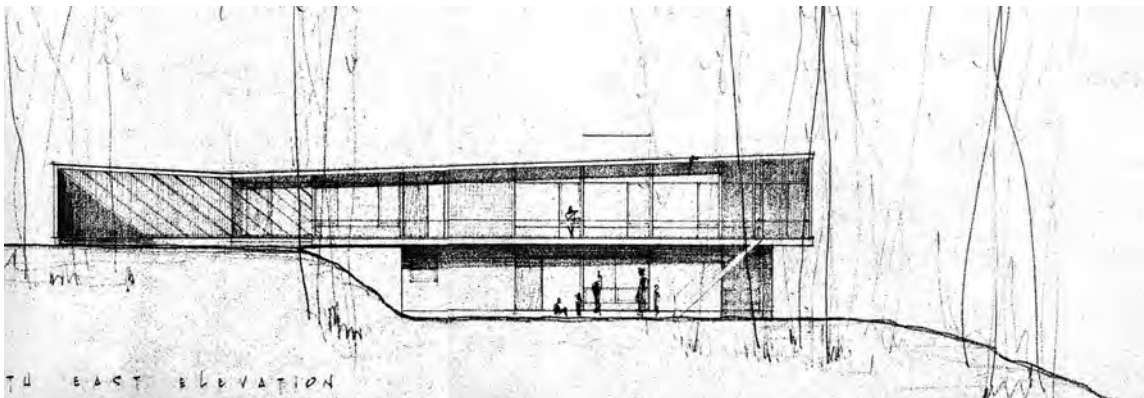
Wallis White House (1959) Schoeler and Barkham, South East elevation.
